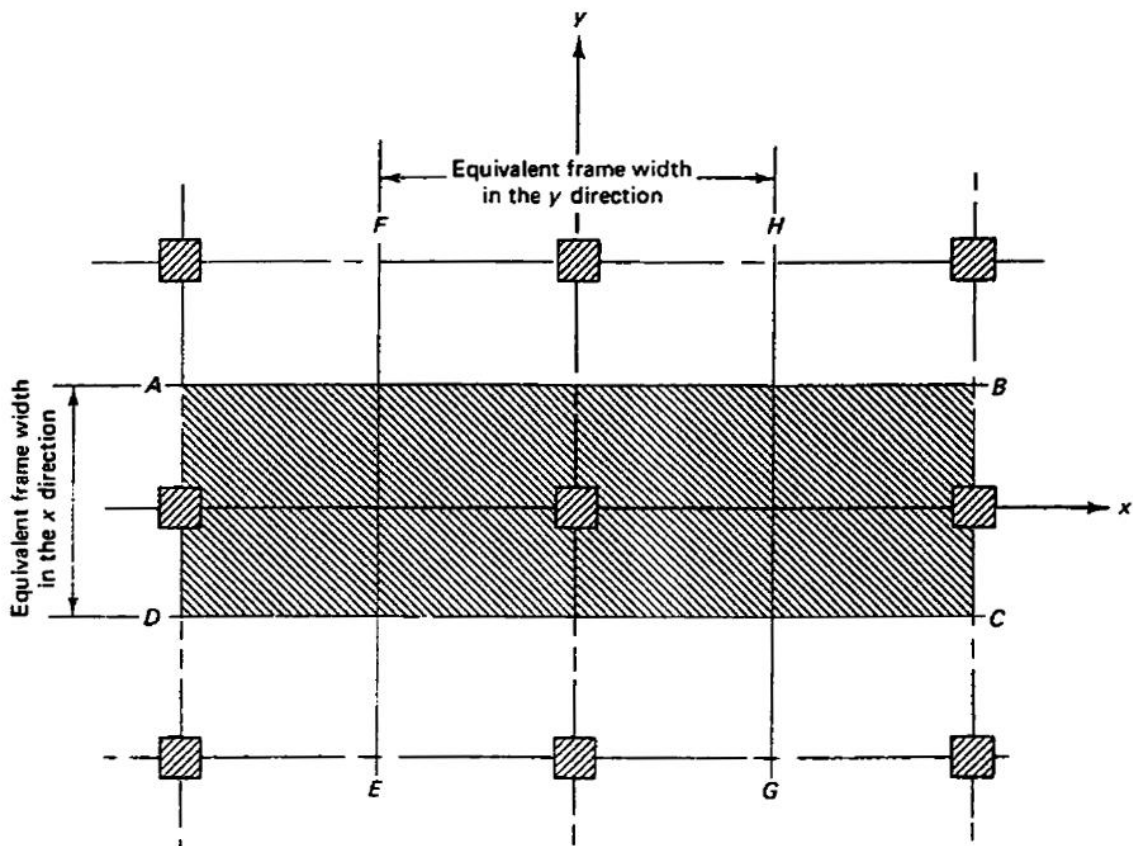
Floor plan with equivalent frame (shaded area in x direction).
